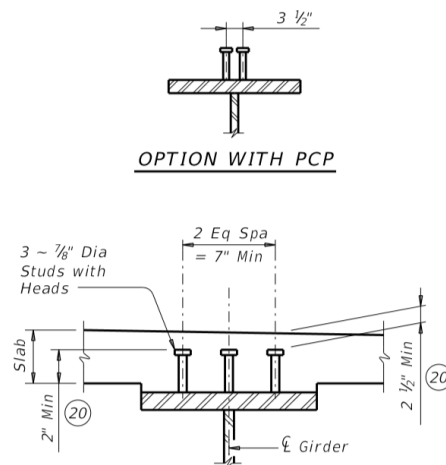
Standard Drawing - Steel Girder Miscellaneous Details (TxDOT 2019a)
